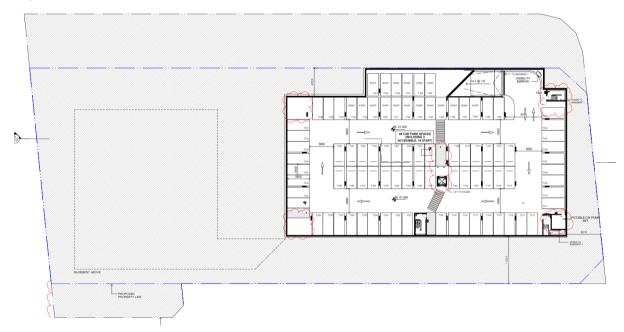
Proposed Modified Basement 2 Plan - DA-698/2019/A
